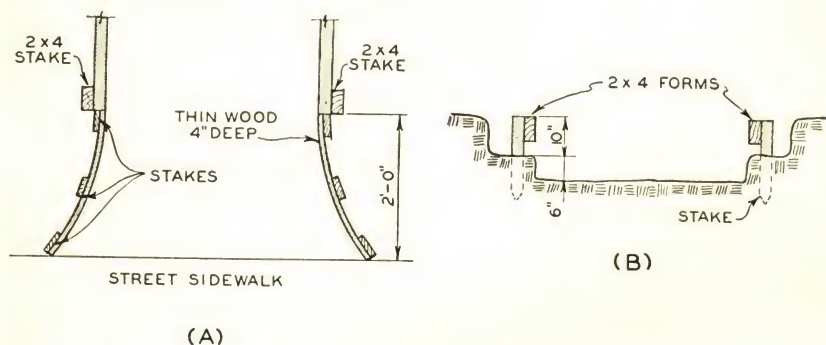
Building Details for Concrete Approach Walk in Fig. 20
